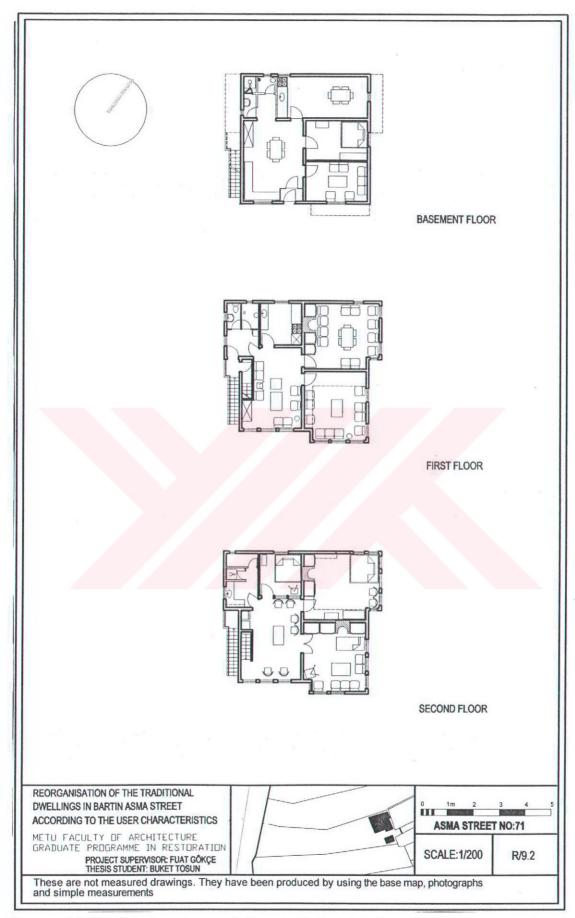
Sketch Drawings of Plans of The Building No:71
